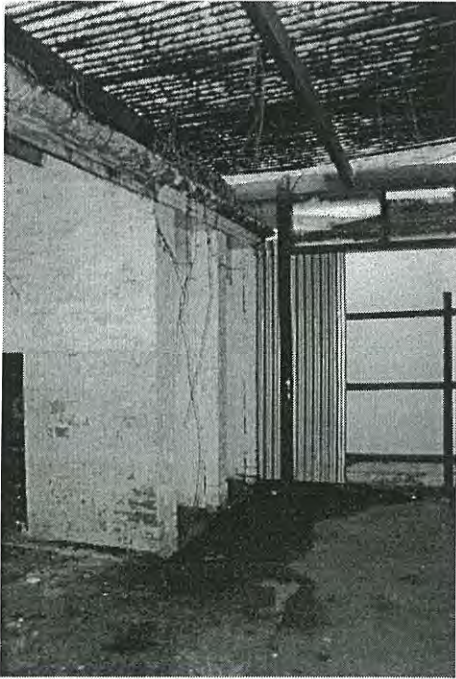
Interior, Men's Toilets (space T01). View looking north-west from south-east doorway. Note the introduced skillion roof and overgrown creeper. Also note the introduced timber framed corrugated galvanised iron temporary northern wall partition and the ponding water as a result of the introduced raised concrete slab to the north of the corrugated partition. Further note that the previous third (northern cubicle) was situated beyond the galvanised corrugated iron partition.
